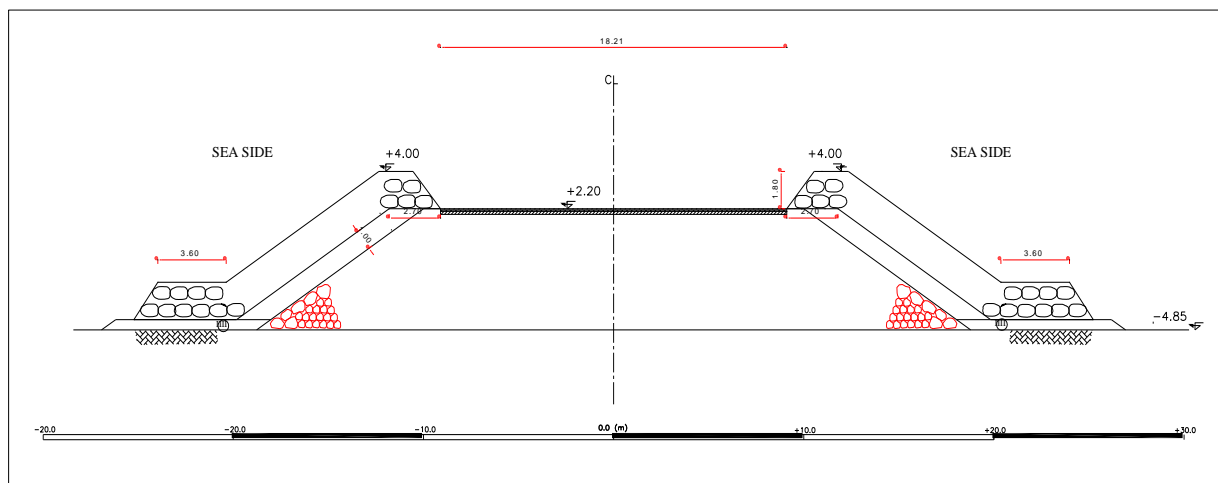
Cross-Section of the Breakwater in the Head (section 2)
